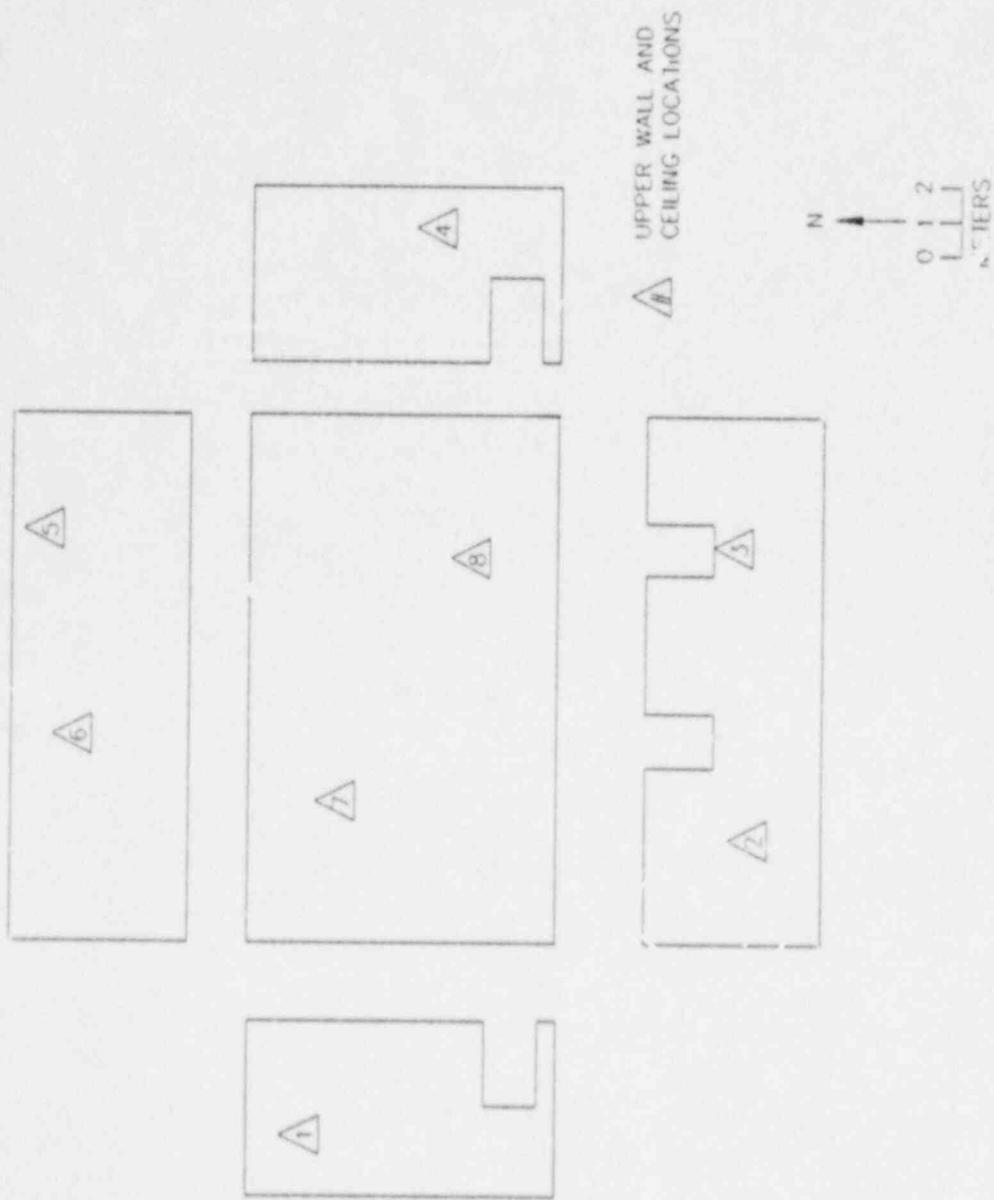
Room 27 Showing Locations of Upper Wall and Ceiling Single-point Measurements
